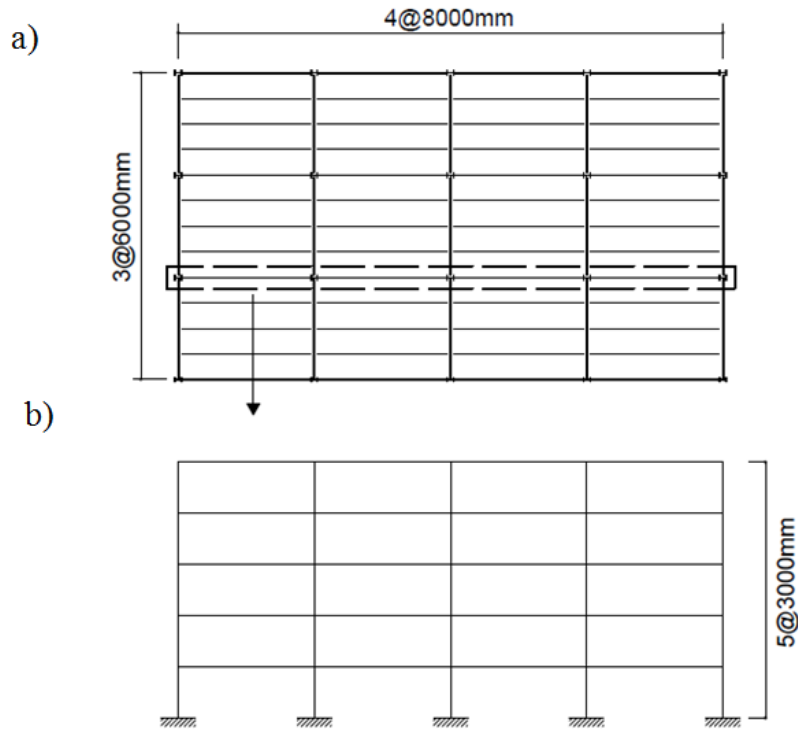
(a) Plan view of prototype building; (b) elevation of interior MRF
